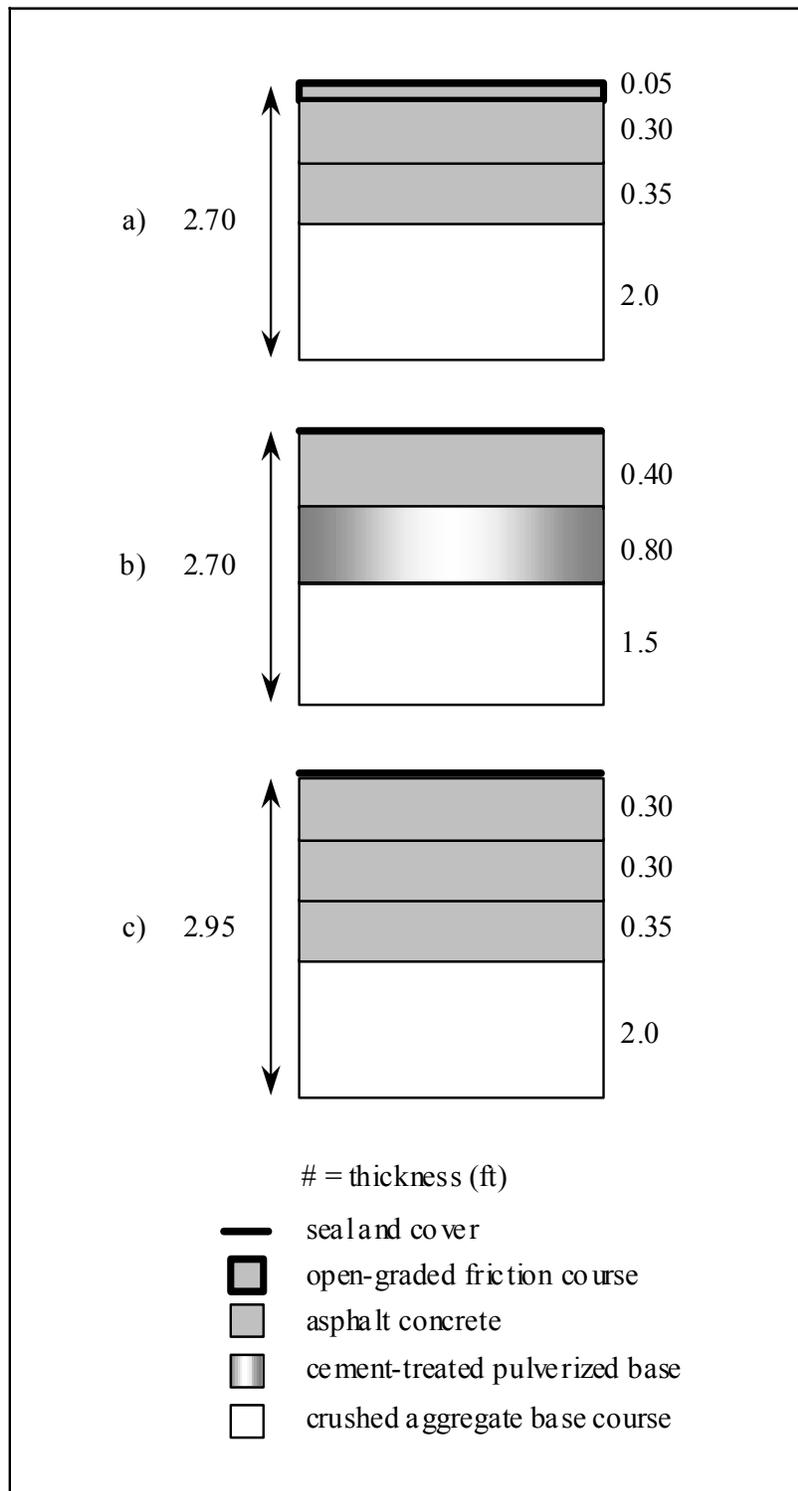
Pavement Cross-Sections at Rocky Canyon:
